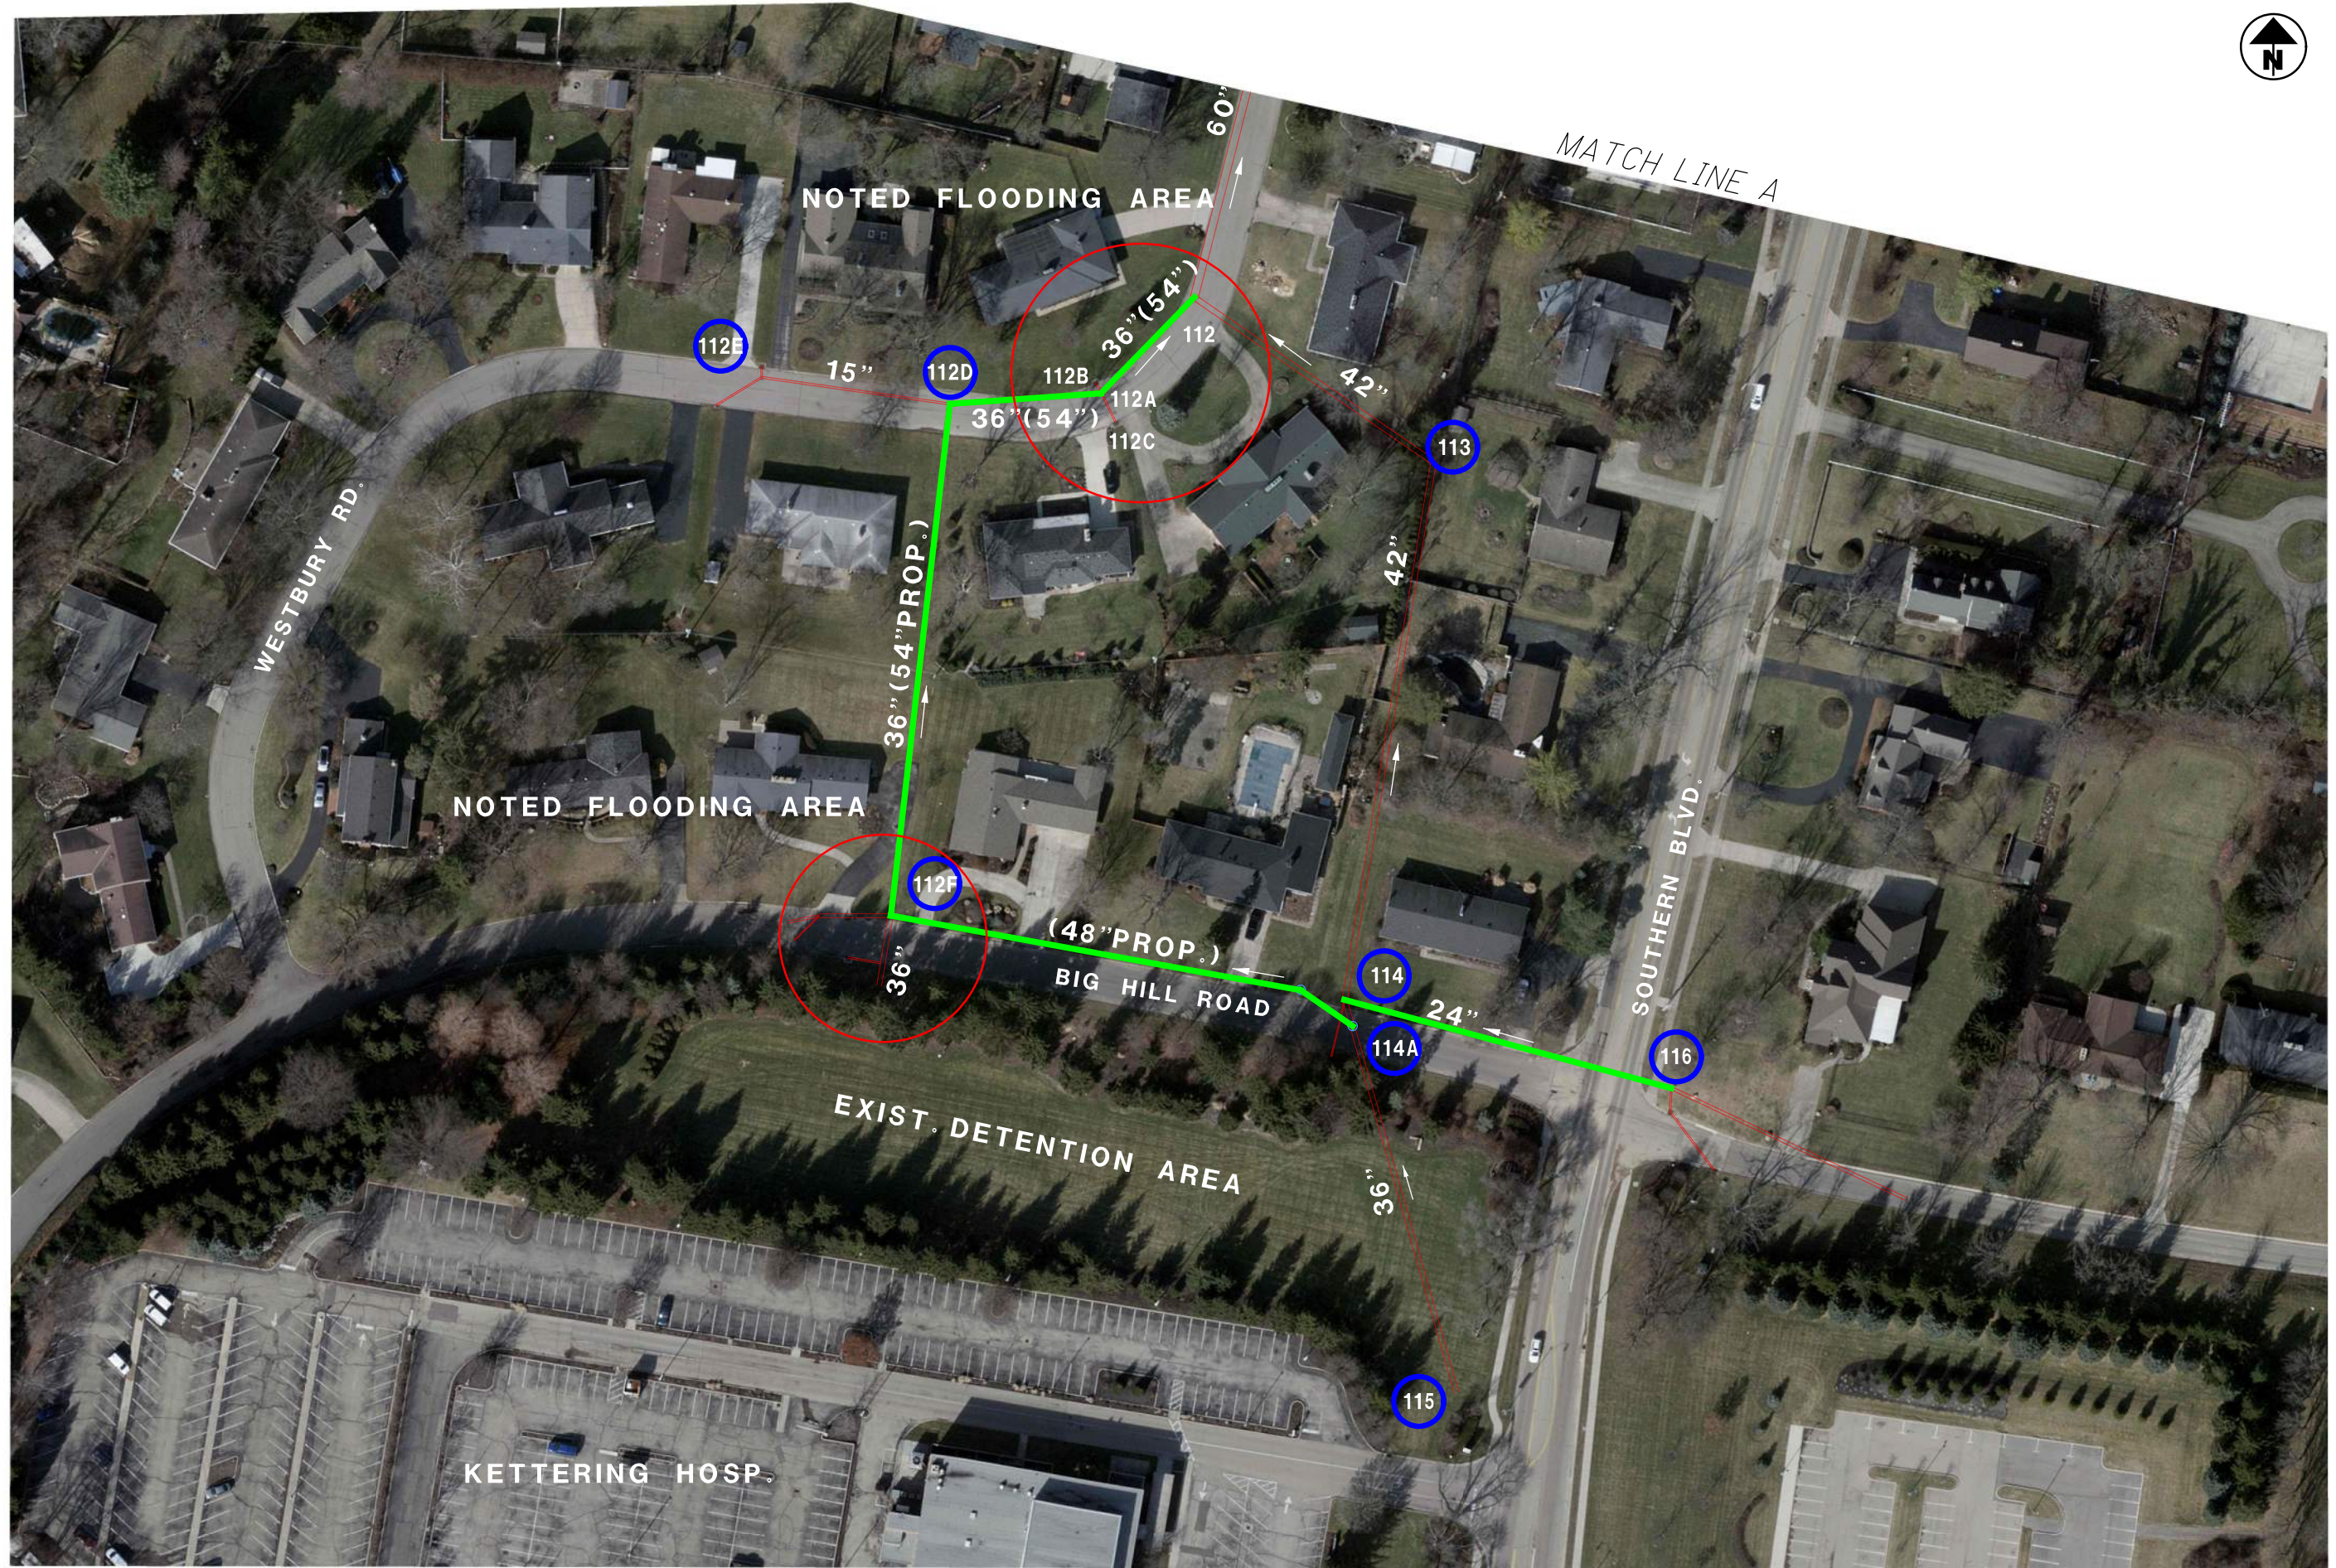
ALTERNATIVE 3, PLAN 1/3
